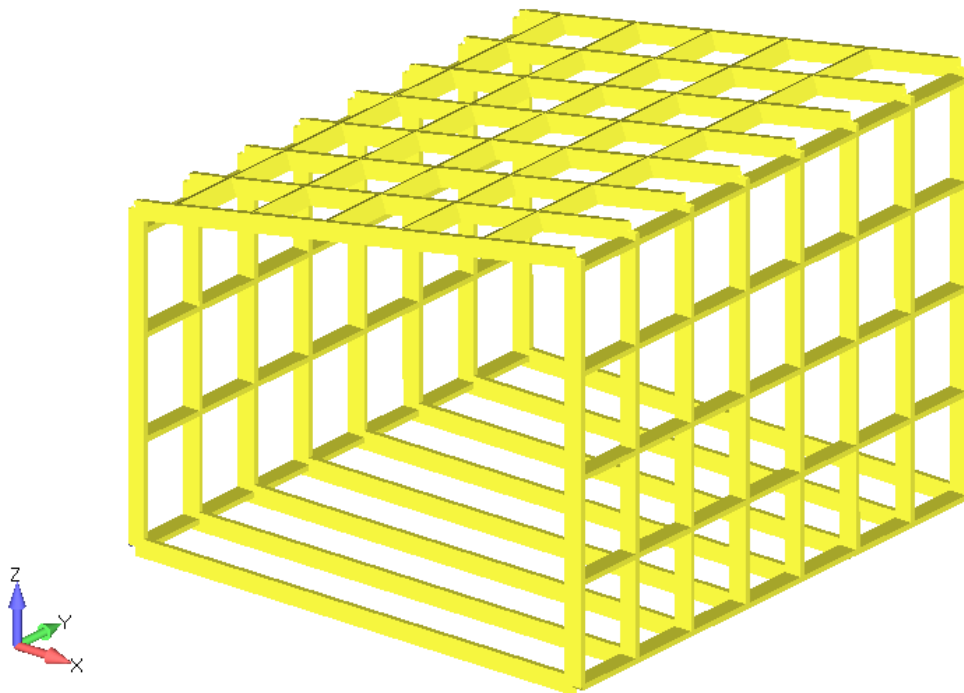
General view of the FINHA-P150L shed-roof building frame, 4.1 meters wide
